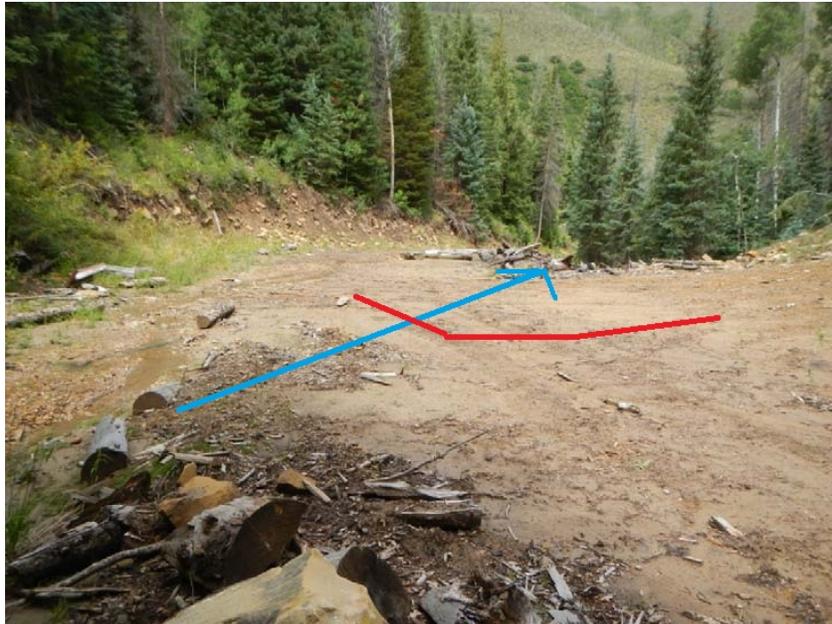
Location of swale to be constructed across logging road in Whiskey Creek.
